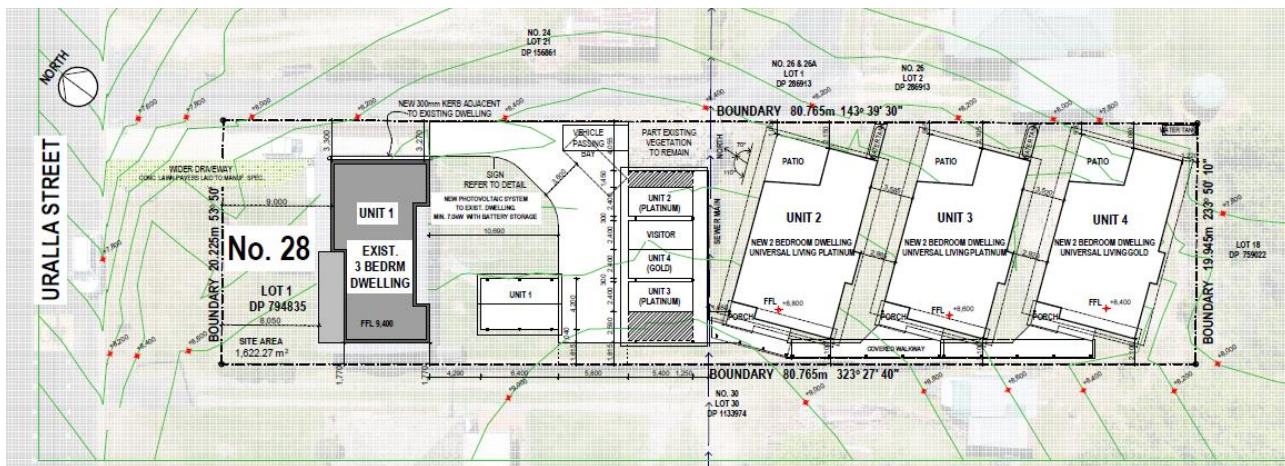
Proposed layout showing the existing dwelling and proposed new units (x3)
